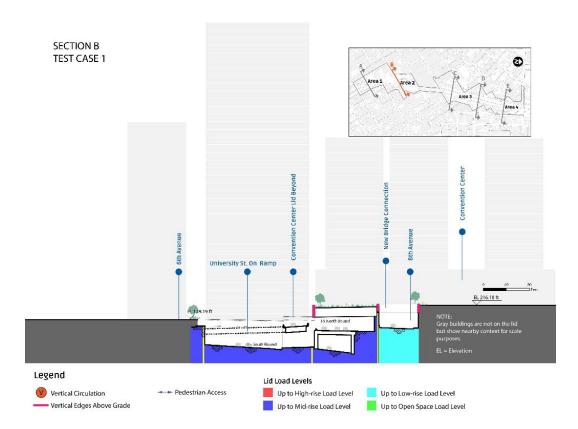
Area 2: Test Case 1 — Cross Sections Before and After Lidding
